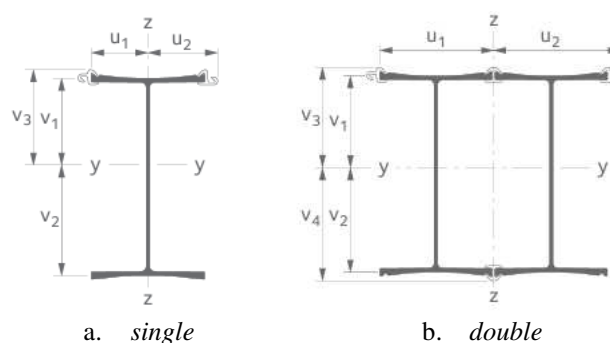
HZ-M king piles geometry (ArcelorMittal Sheet Piling, 2020)
